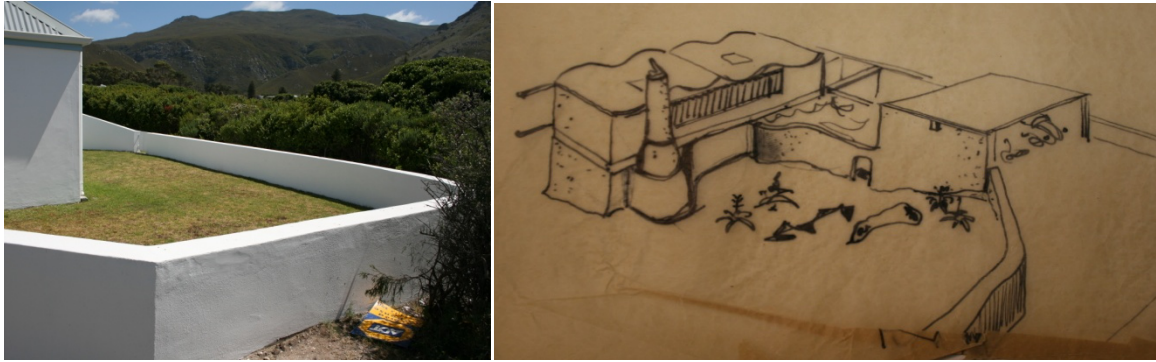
Previous page left: Moulded roof to House Swanepoel in Cape St. Francis (1980) (Fagan archive - Job. No. 8011, undated). Previous page right: External walls rise and fall to meet roof profile (1967) (Author, 2008). Left: Enclosing boundary wall at House Swanepoel in Hermanus (1990) (Author, 2008). Right: Fagan's preliminary sketch for Die Es (1965) showing organic walls and chimney (Fagan archive - Job No. 656, 1964).
